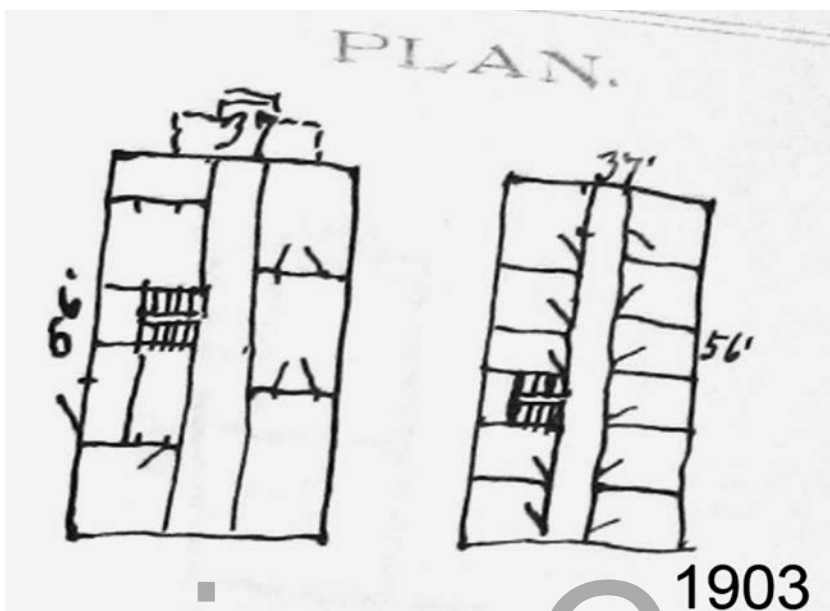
Sketch of the Crystal Palace floorplan from the 1903 building permit registered with the City of Fargo. (Photo by author.)
